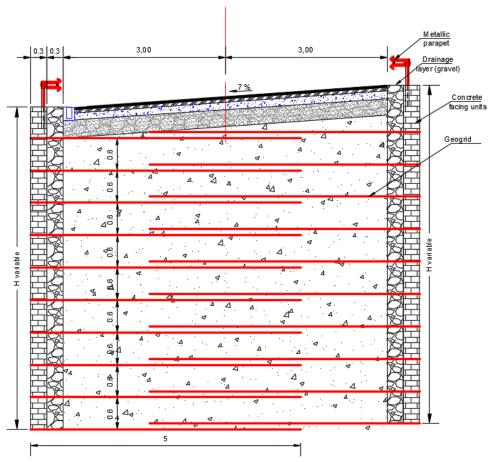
Typical cross-section of the designed back-to-back reinforced wall
